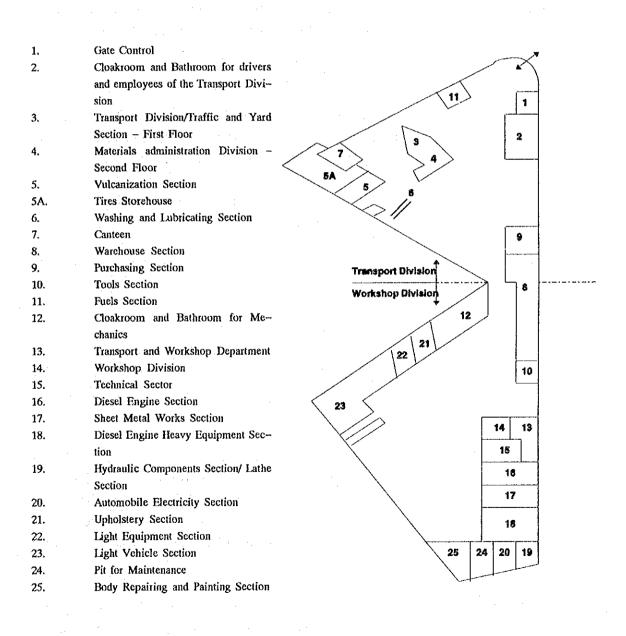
Layout Improvement Plan of the Present Workshop
